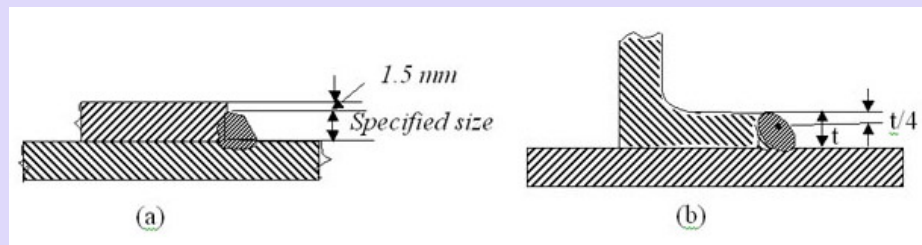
(a) Fillet welds on square edge of plate, (b) Fillet Welds on round toe of rolled section
